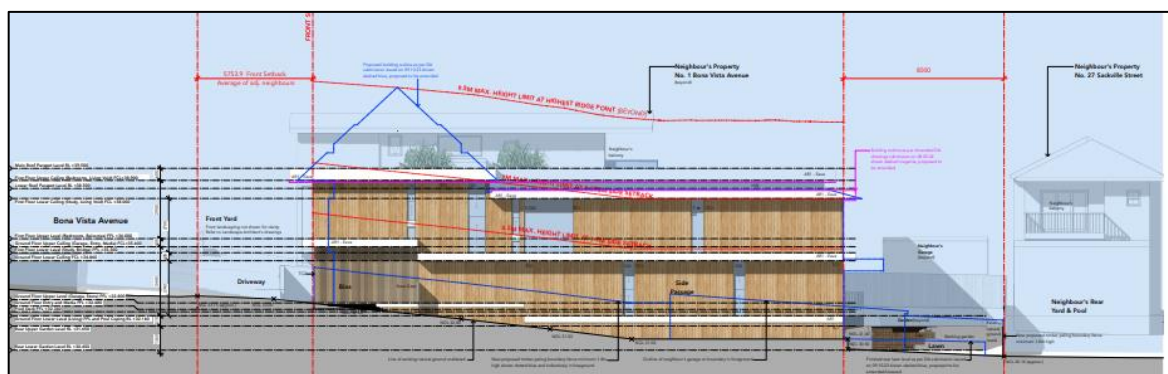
Southern Elevation of subject Development – 3-7 Bona Vista Avenue (Source: Dominic Levene)
